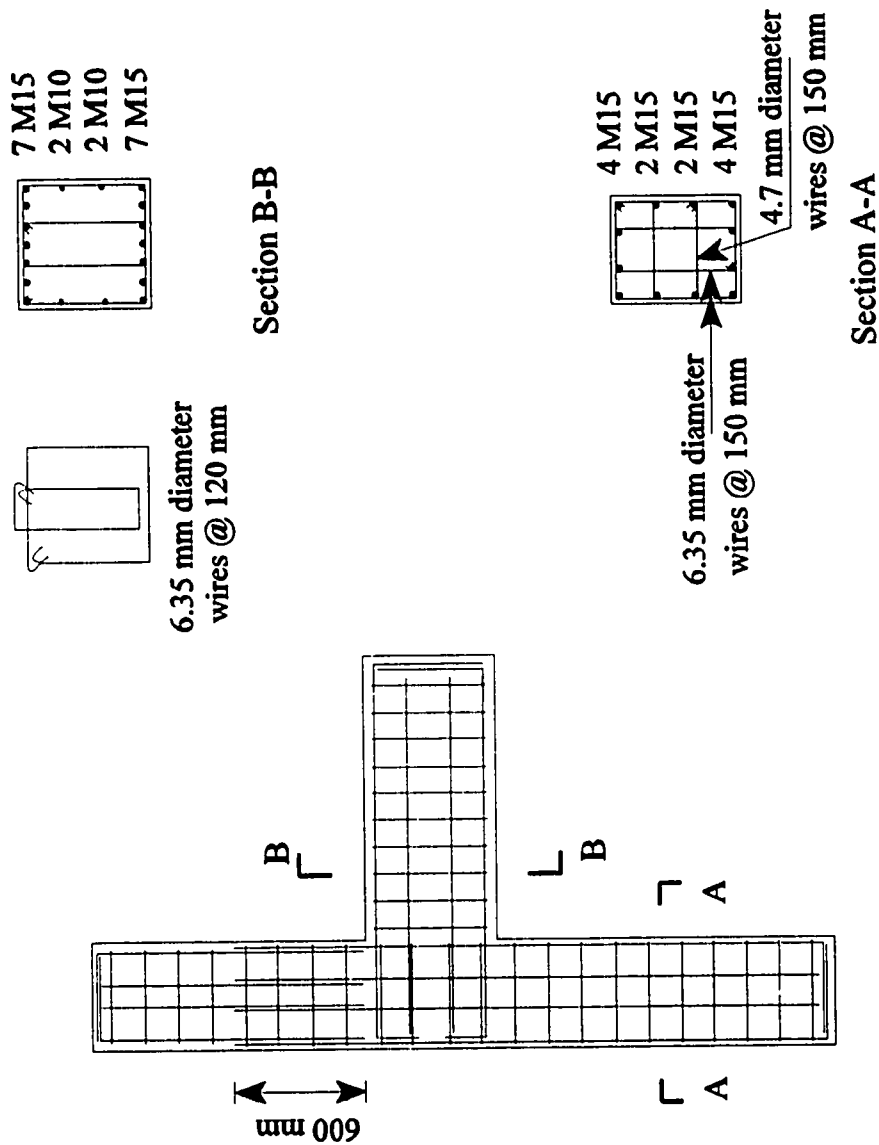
Details of reinforcement of specimens J1, J3 and J5
